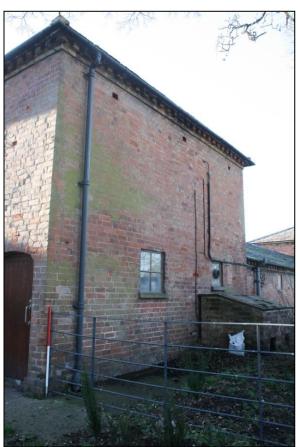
Oblique view of the north elevation of Building 22, viewed looking south-west. Scale = 1m.
